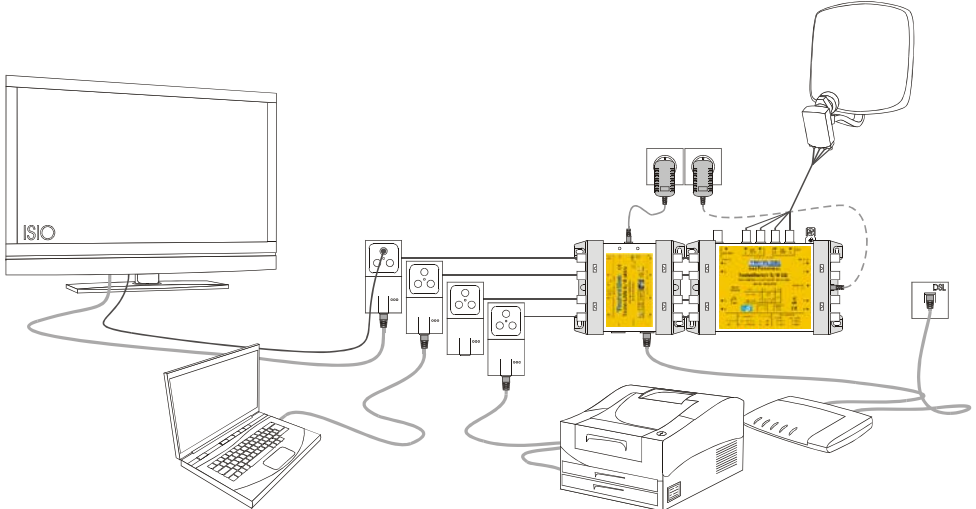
Installation example, DSL modem (internet connection) connected to a TechniLAN 4/4 aktiv
